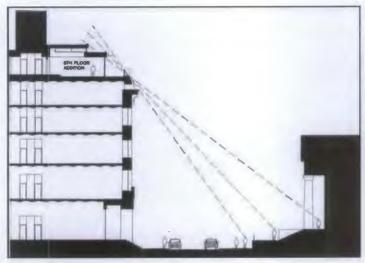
How to Evaluate a Proposed Rooftop Addition.
